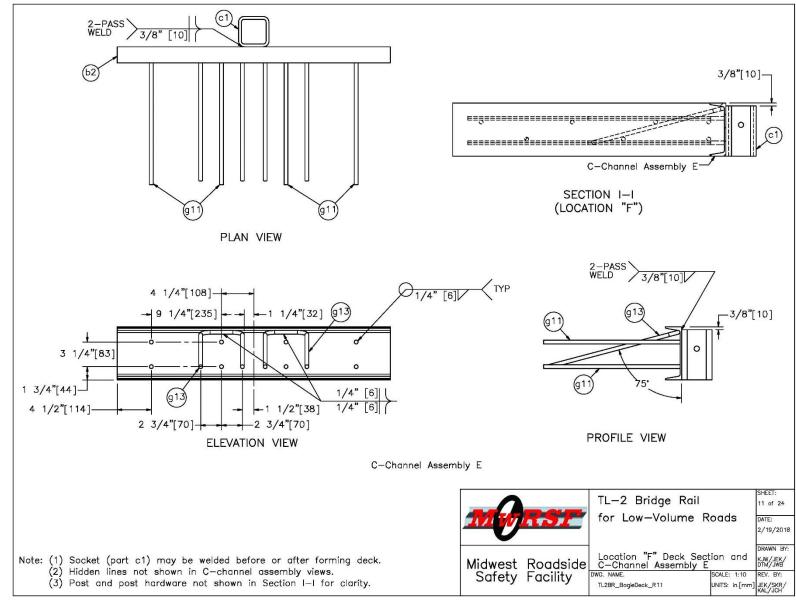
Bogie Testing Matrix and Setup, Location "F" Deck Section and C-Channel Assembly E
